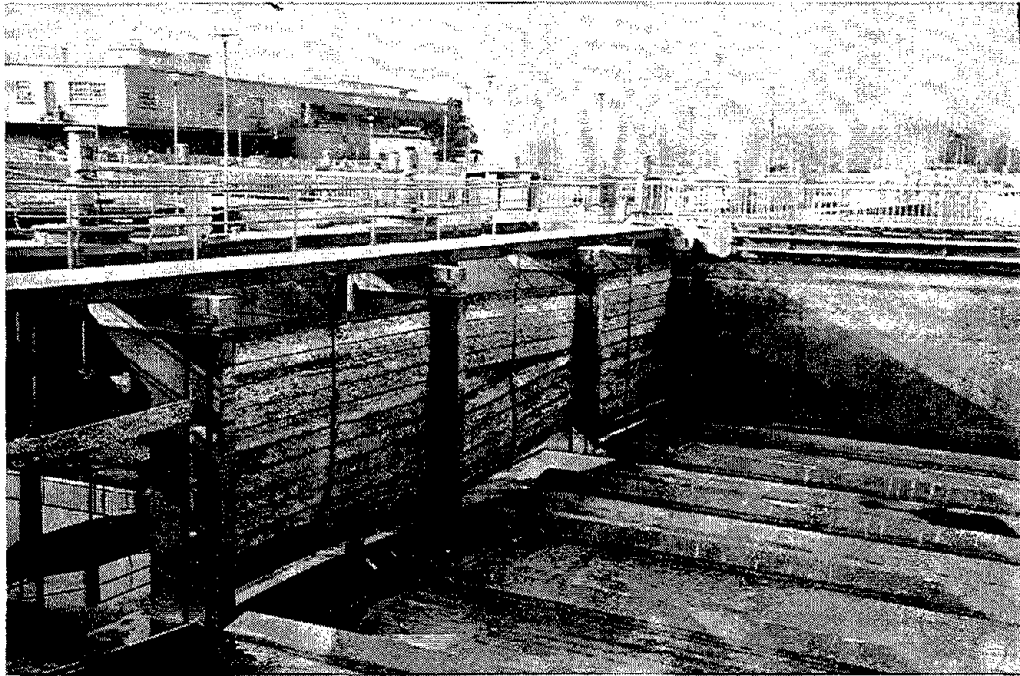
Floating wood baffles dislodged by sloshing at water treatment plant. (MWD)
